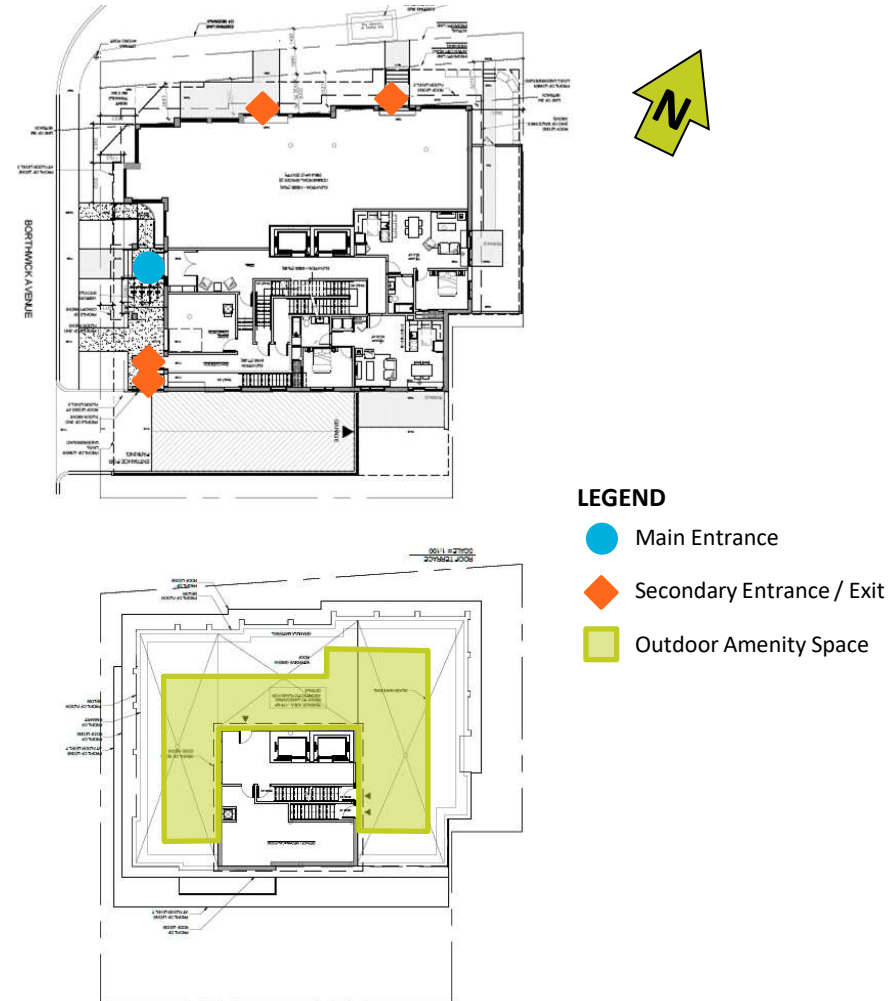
Updated ground floor plan (top) and roof plan (bottom)
